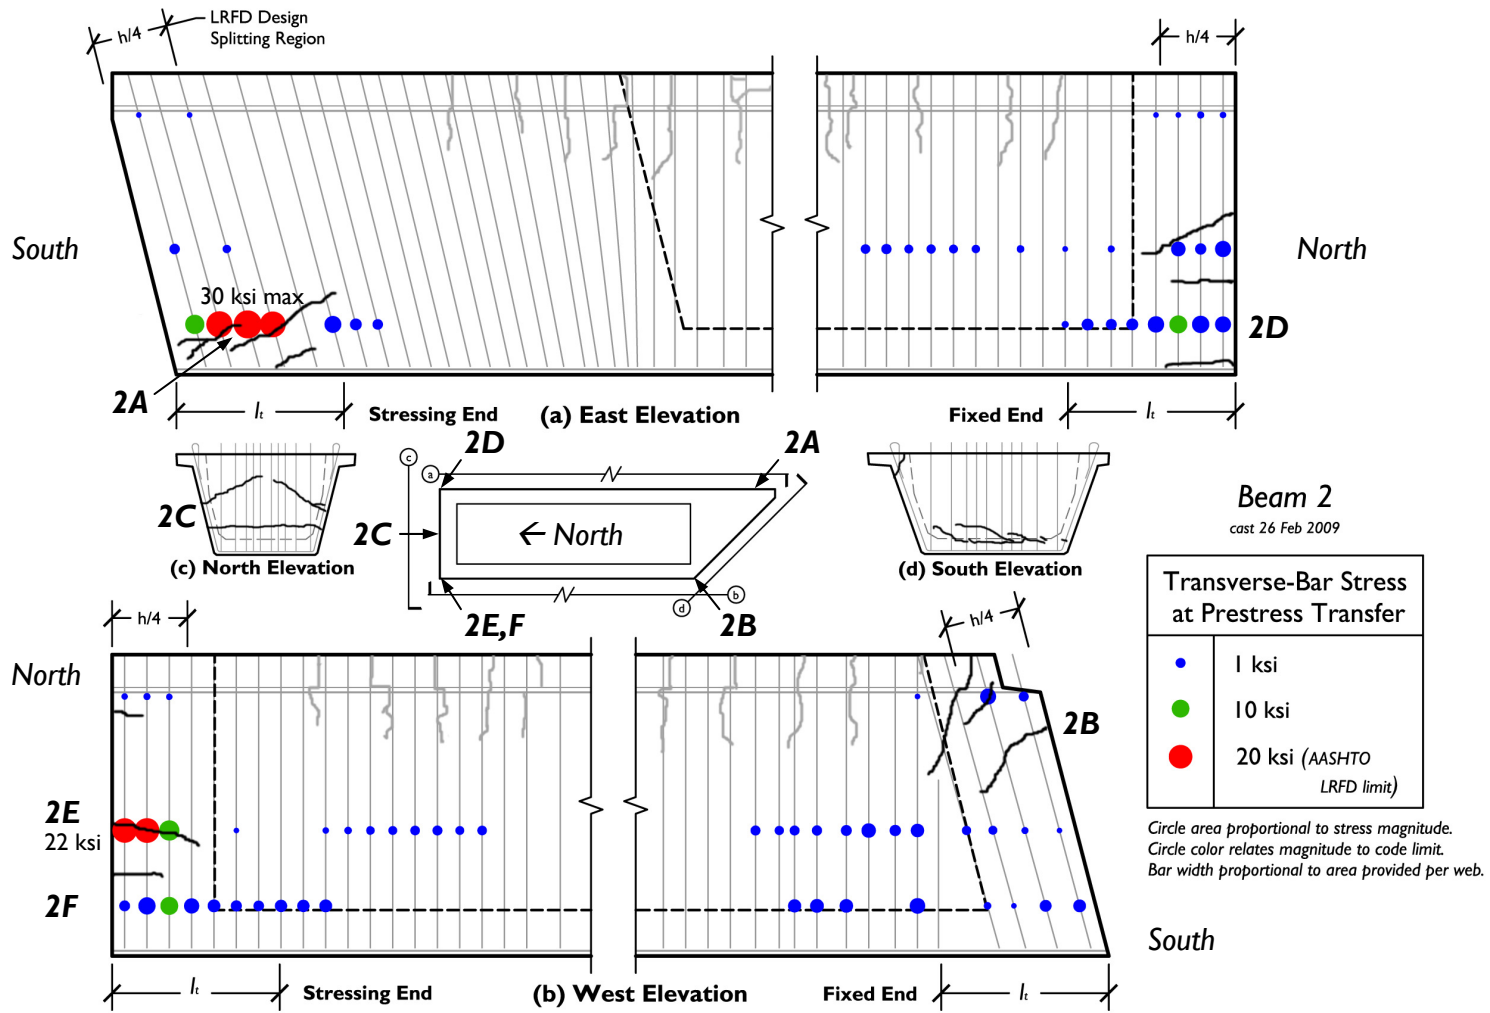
Beam 2 transverse-bar bursting & spalling stresses, with cracking from transfer
